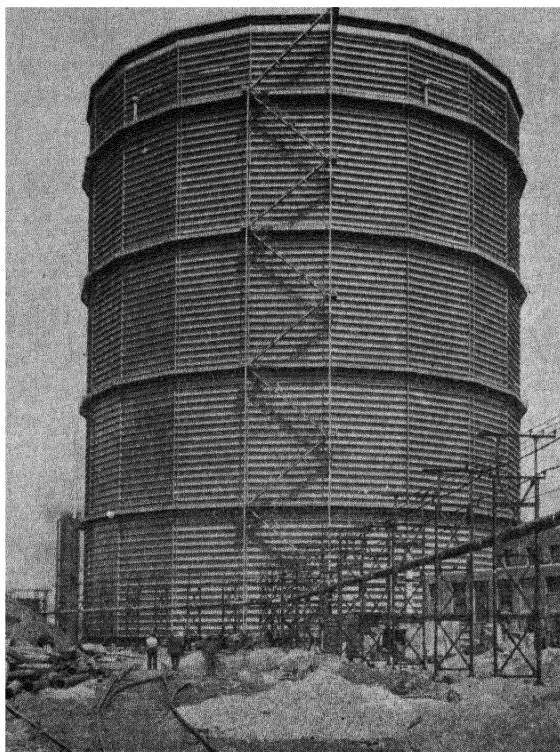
Gas holder—new type. (Courtesy of The American Rolling Mill Company.)
